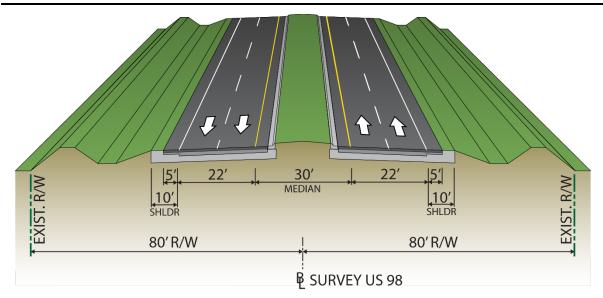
Proposed US 98 C2 (Rural) Typical Section
